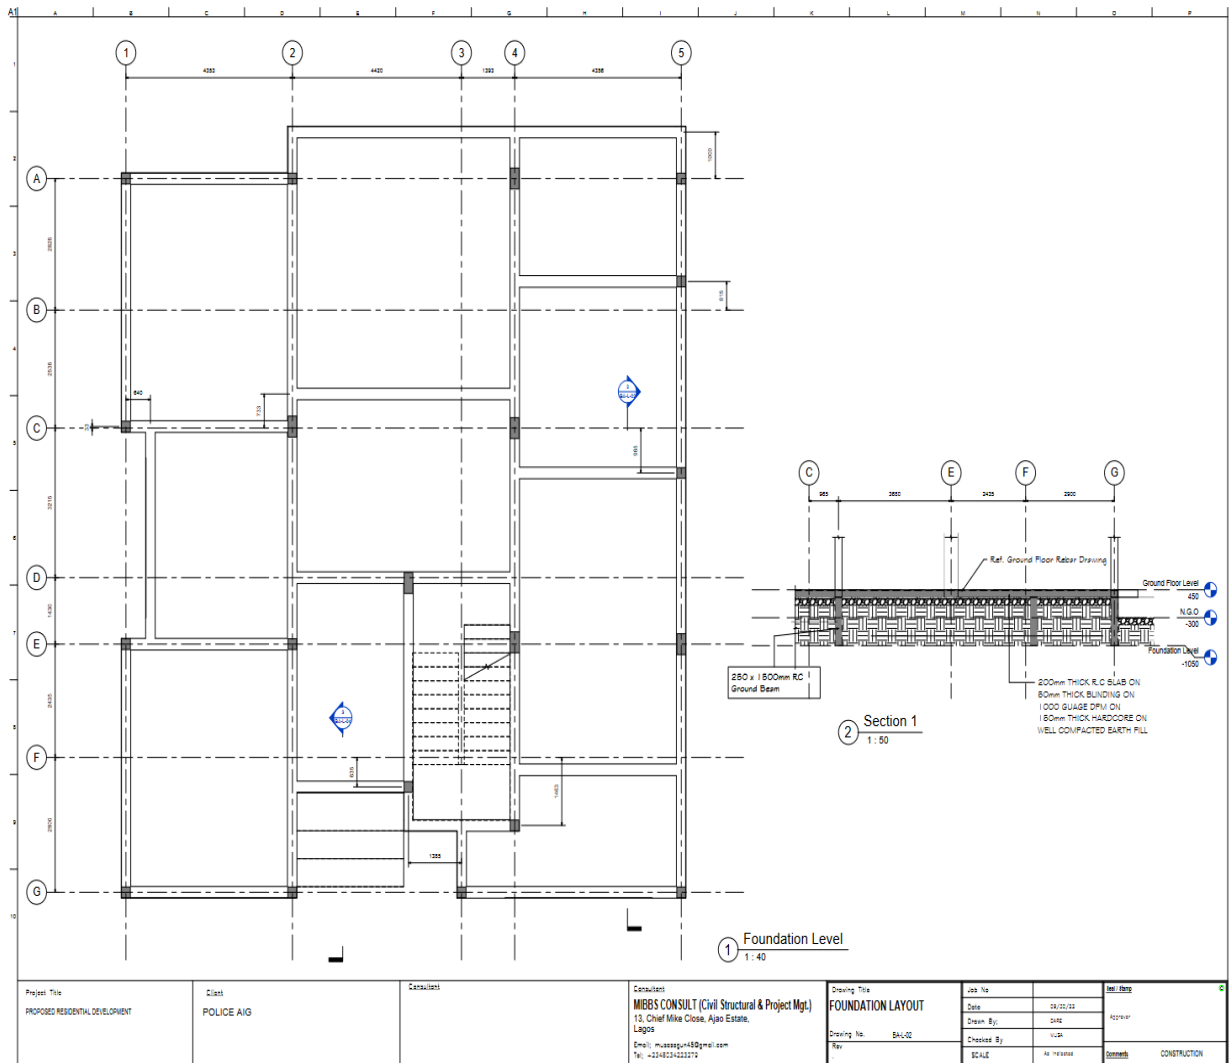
STRUCTURAL GROUND FLOOR/PLAN AND SECTION OF BEAM AND SLAB FOUNDATION IN NIGERIA
